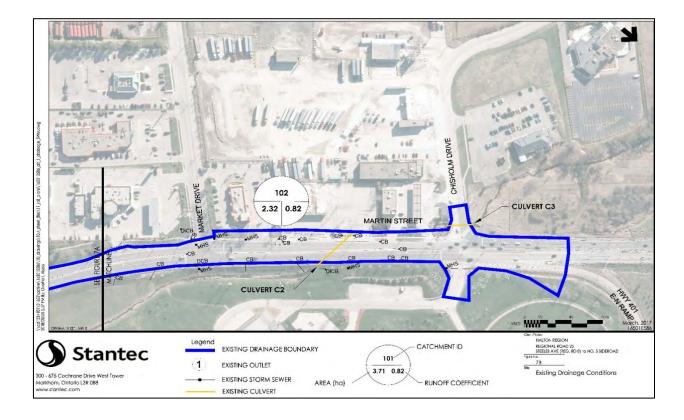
Existing Drainage Conditions (South of Market Drive to Highway 401)
